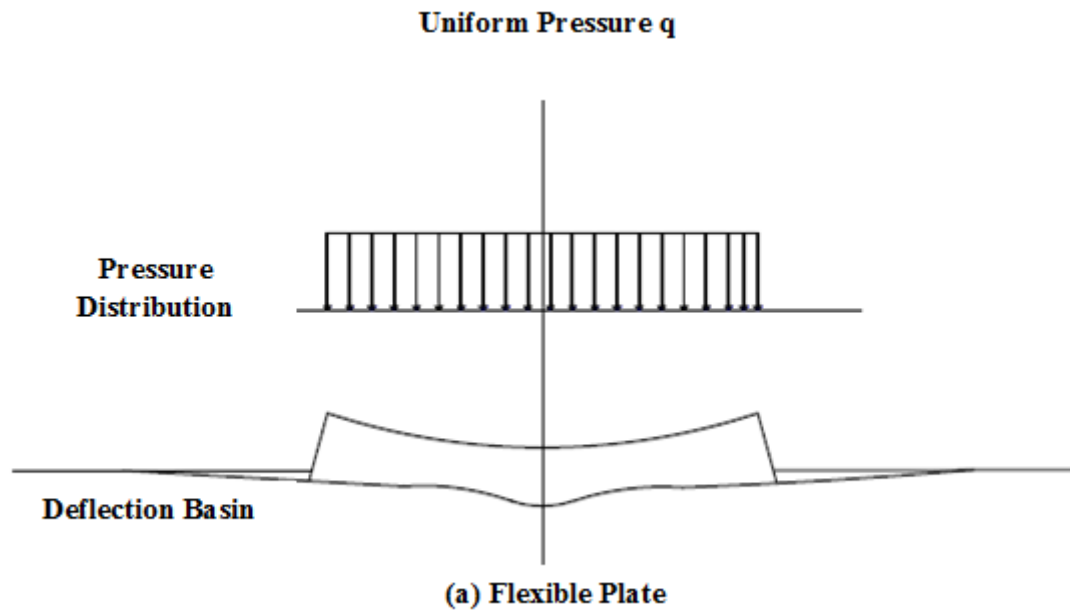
Flexible Pavement Load Distribution (Huang, 1993)
